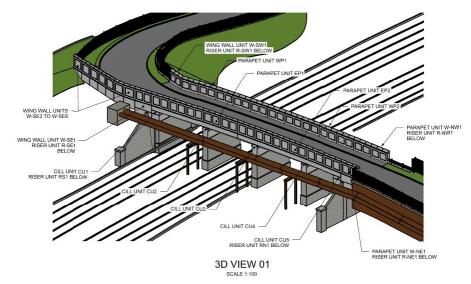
Extract from the Proposed General Arrangement reconstruction drawing
